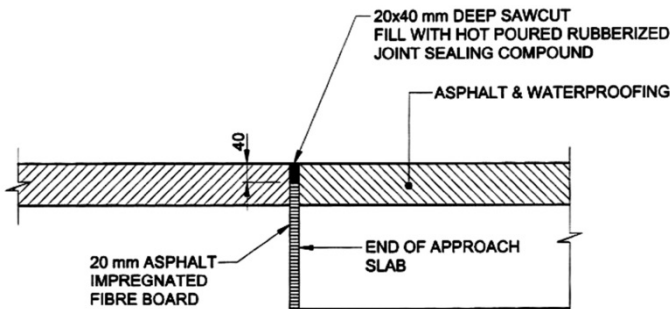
Expansion joint at the end of approach slab for concrete bridge shorter than 100m and steel bridge shorter than 75m (Husain, 2004)
